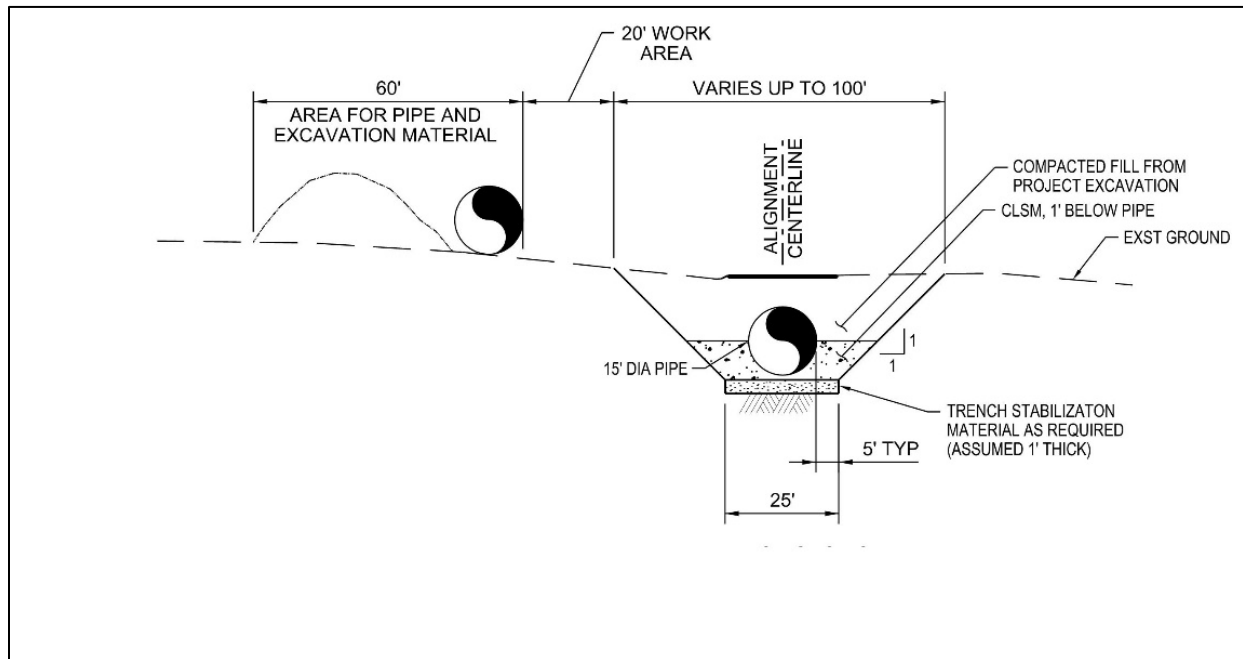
Typical Construction Condition for Aqueduct Installation – BRPP to DMC
